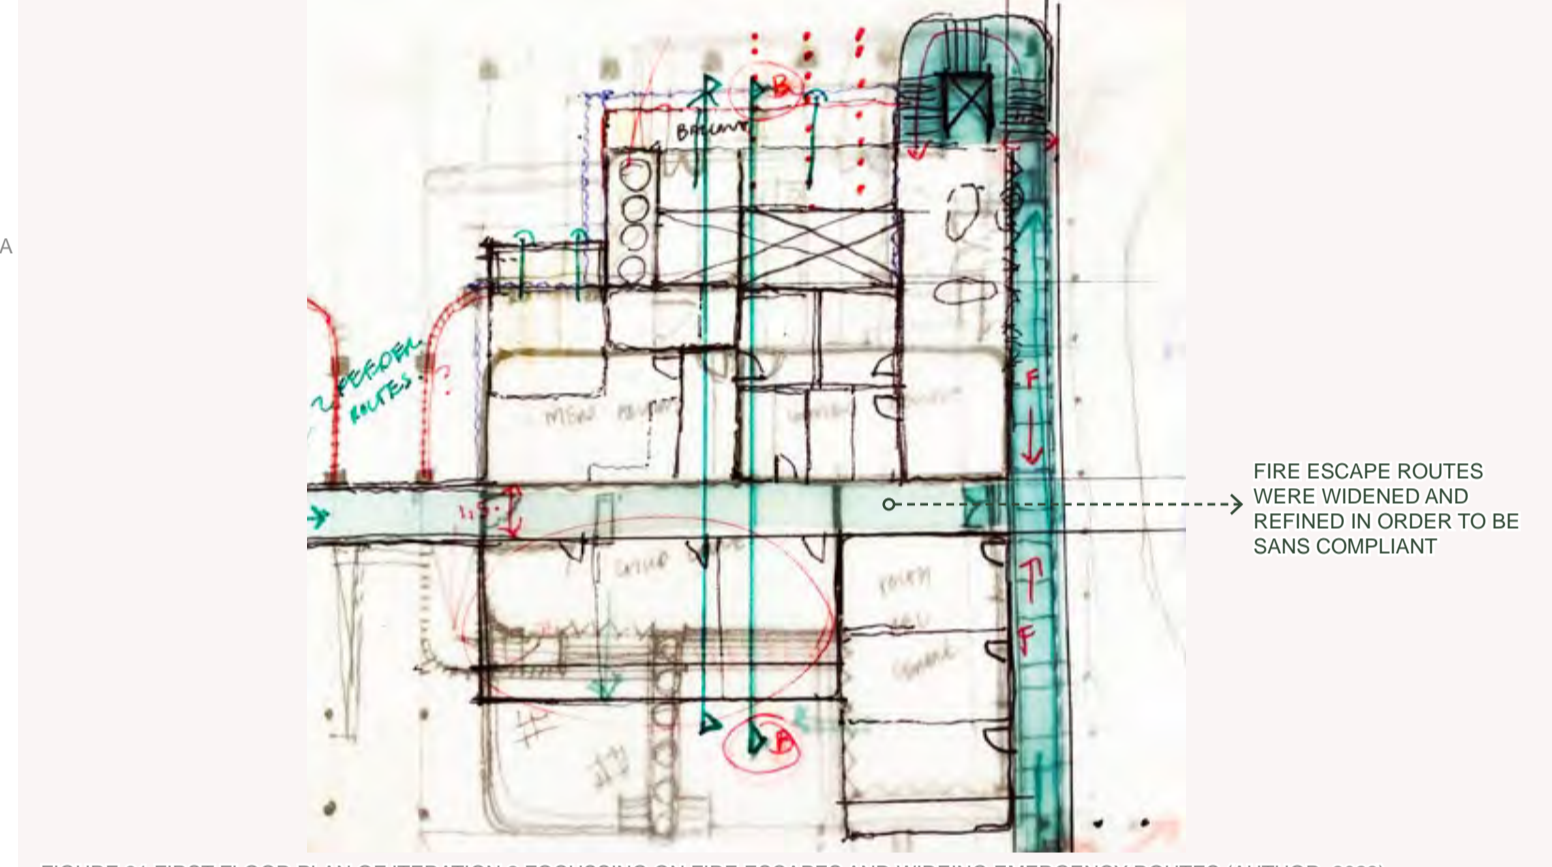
FIRST FLOOR PLAN OF ITERATION 2 FOCUSING ON FIRE ESCAPES AND WIDENING EMERGENCY ROUTES (AUTHOR, 2023)
